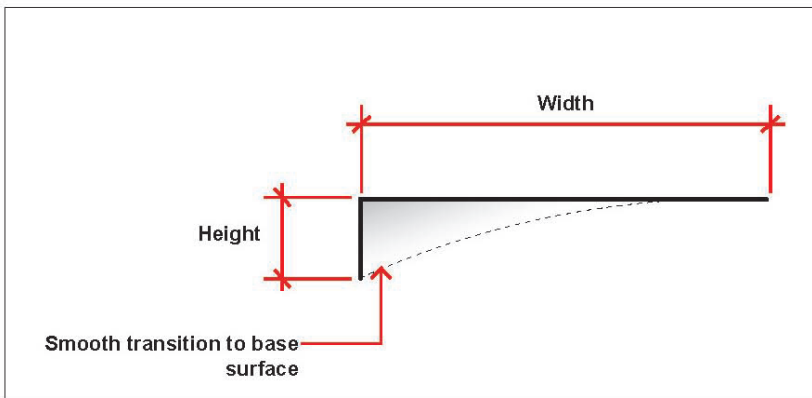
A: FF-1 Upward facing striation elevation
